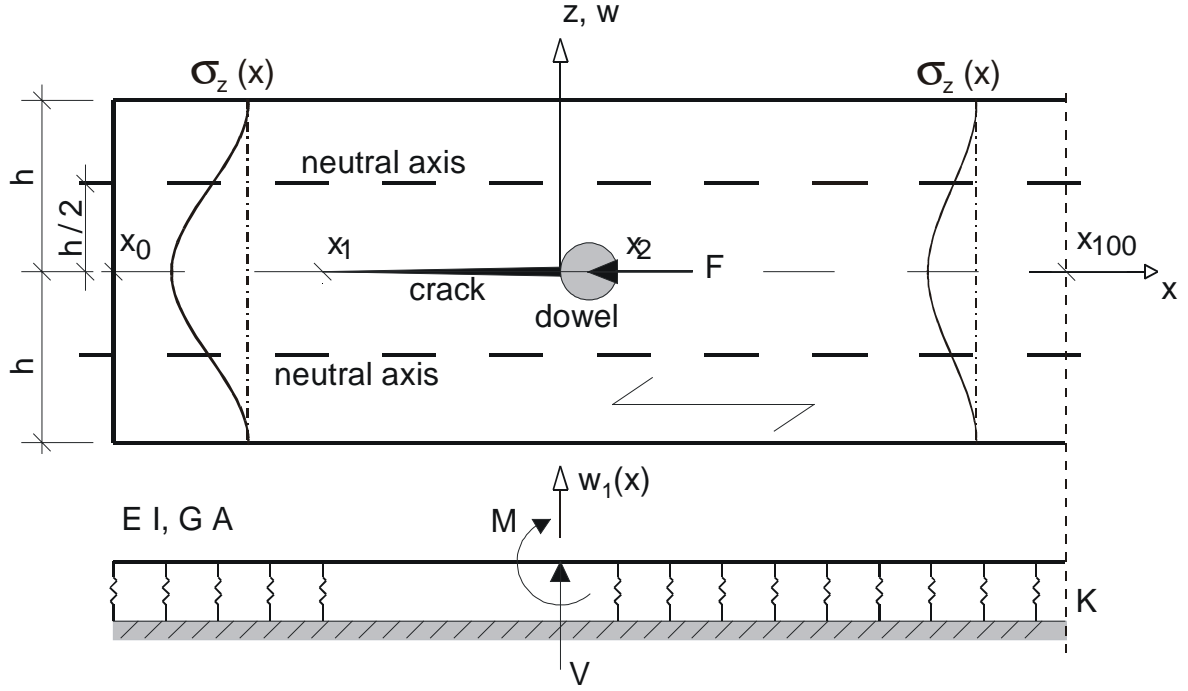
modelling the cracked joint as a beam on elastic foundation
